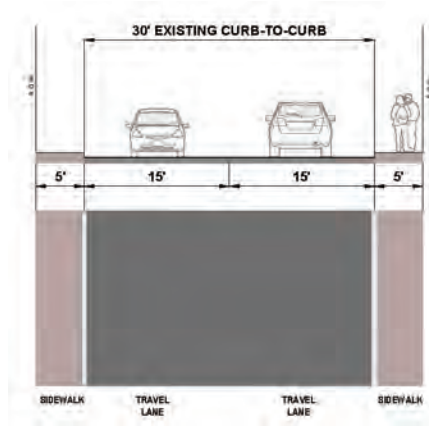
Saratoga Avenue Existing Typical Section From Bay Road To Newbridge Street (Facing North)
